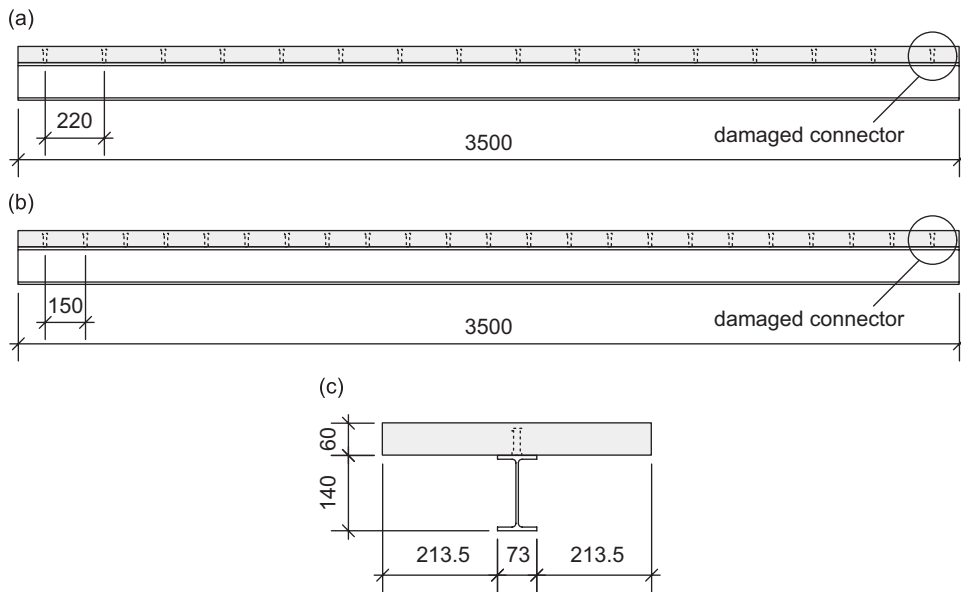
Steel–concrete composite beams investigated in experiments (see Ref. [13]): front view of (a) T1PR beam (partial connection) and (b) T1CR beam (total connection); (c) transversal section. Lengths in millimetres.
